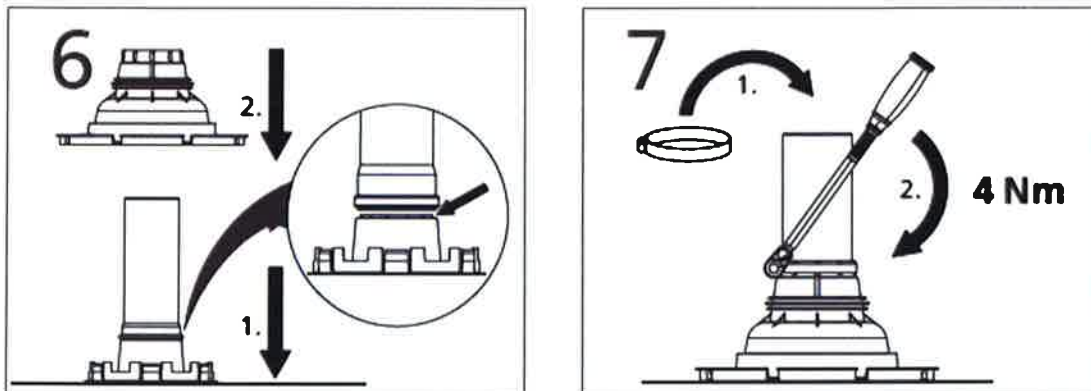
Connection of the KG-pipe and the tundish (manufacturer's drawing).
